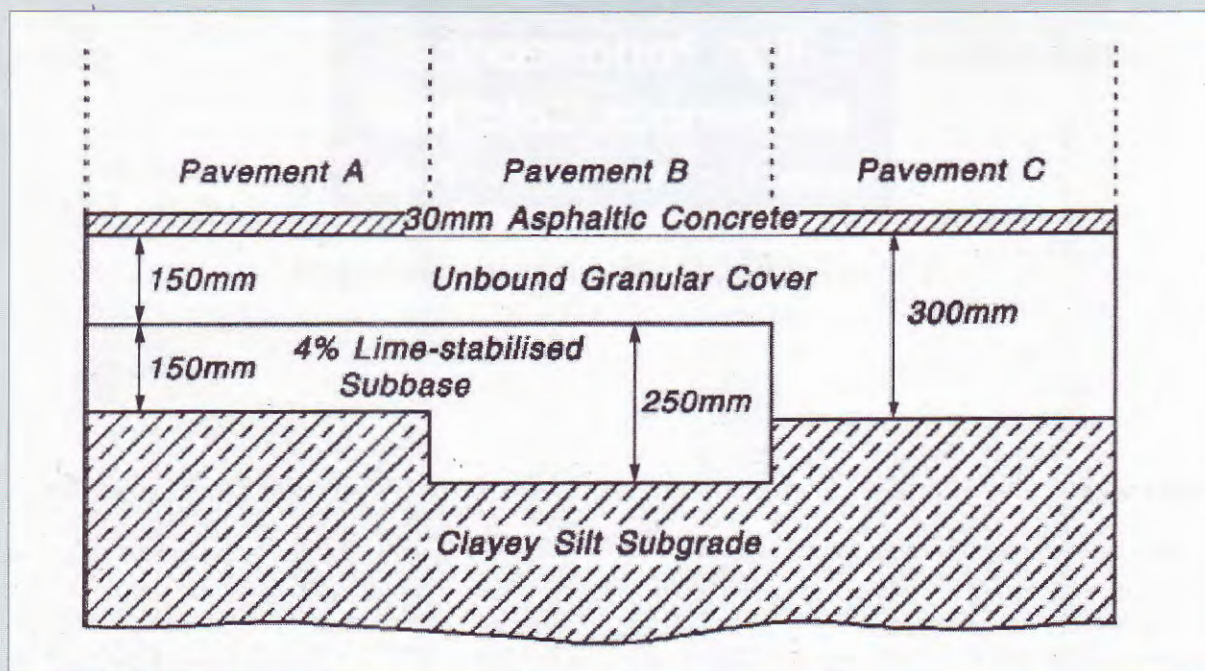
Cross-section of Lime Stabilised Subbase Pavements
